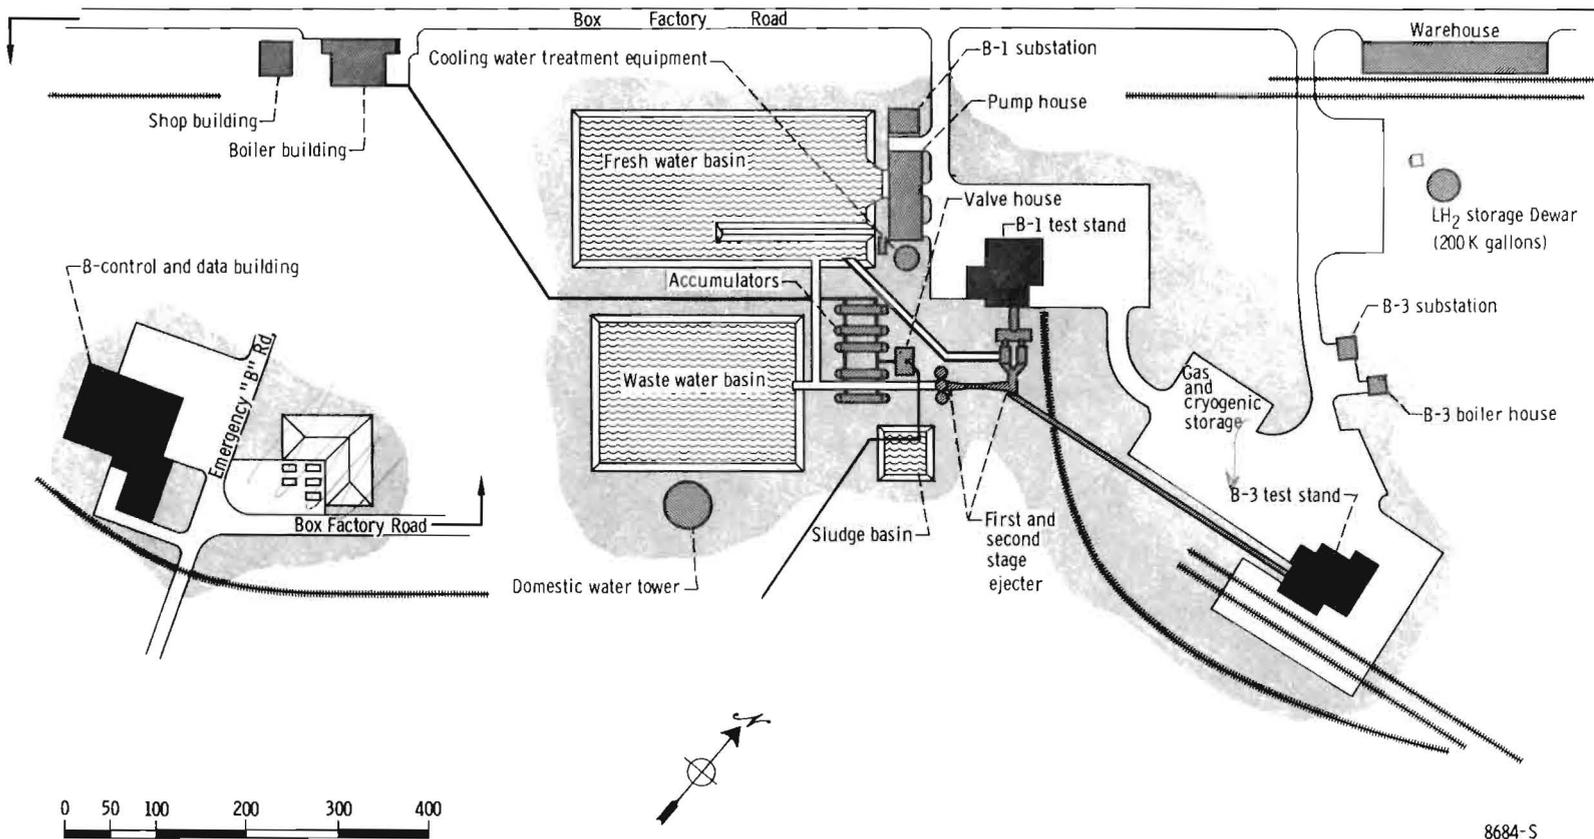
, - Plot plan of Plum Brook station showing location of "B-1" and "B-3" facilities.
